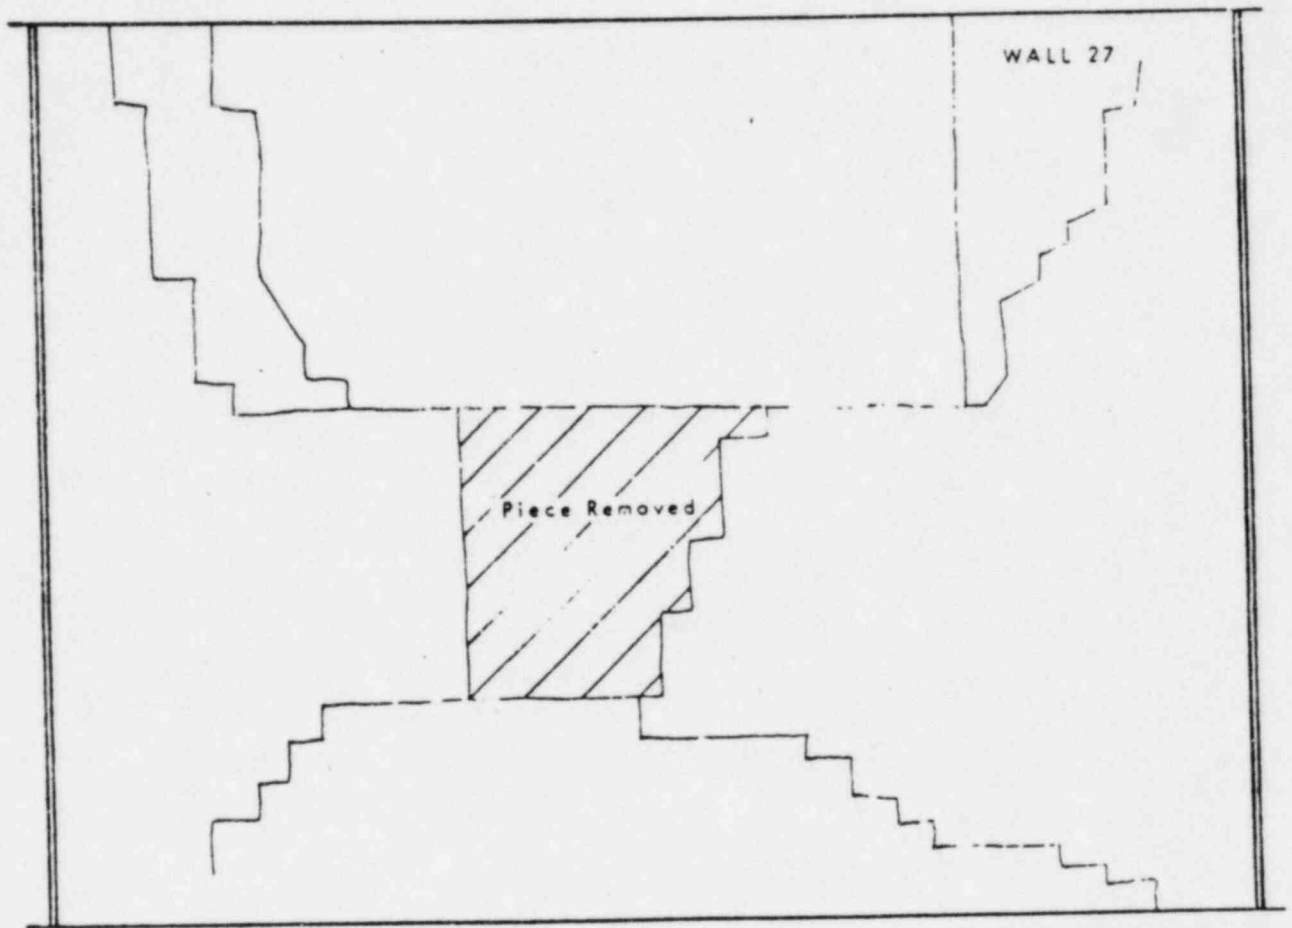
Sketch of downstream face of plate-mounted wall after loading with overpressure of 3.5 psi.
